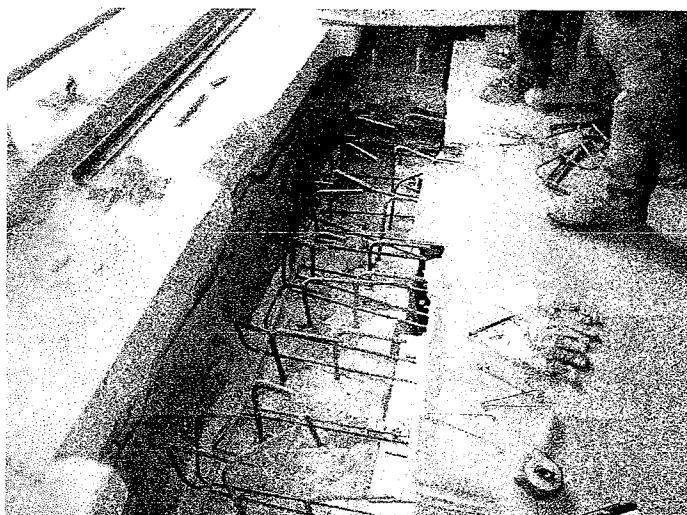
Preparation for Concrete Grade Beam at Grid A/2.5
